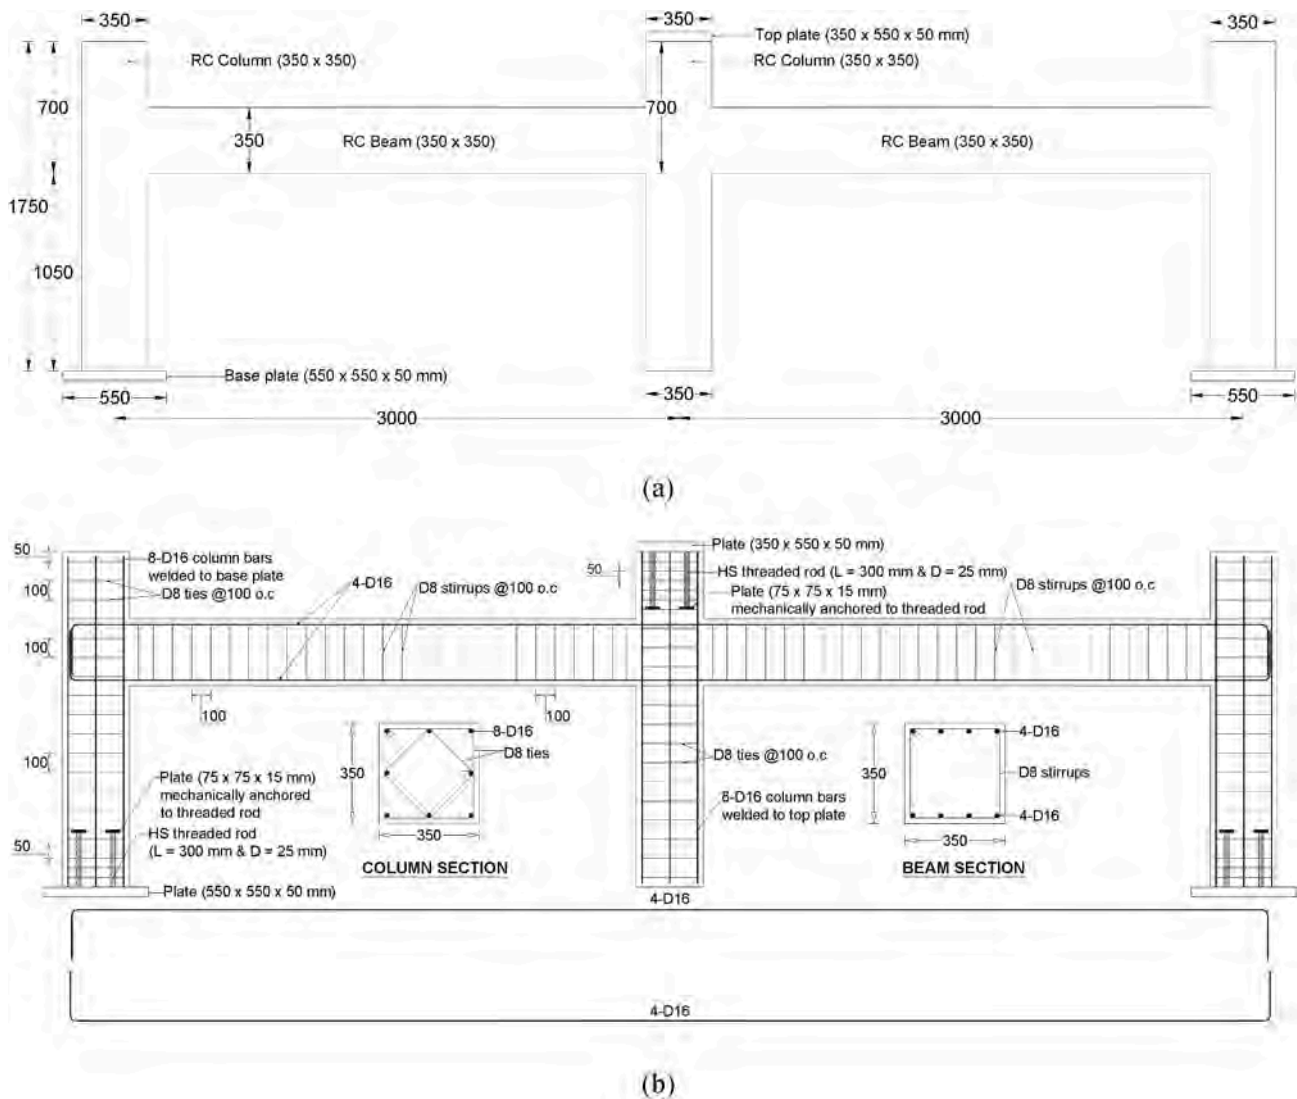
Details of monolithic specimen MC-SMF as taken from Ref. [32] (Note: All dimensions are in mm): (a) Test specimen; (b) Reinforcement details.
